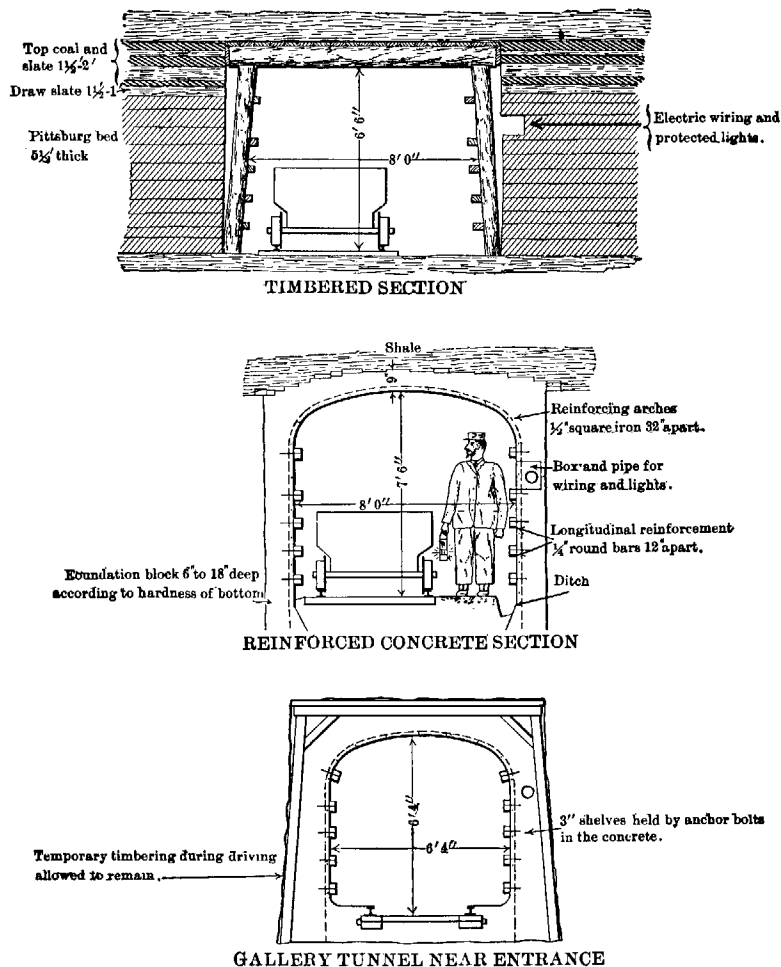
Cross-sectional views of mine gallery, showing dust shelves.
